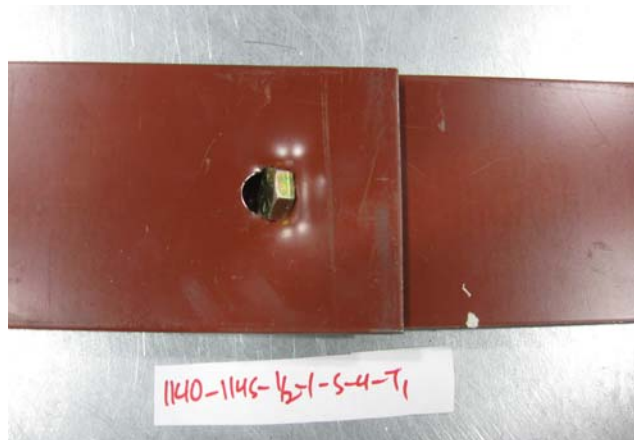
Bearing Failure of Test Specimen 114O-114S-1/2-1-S-4-T1
